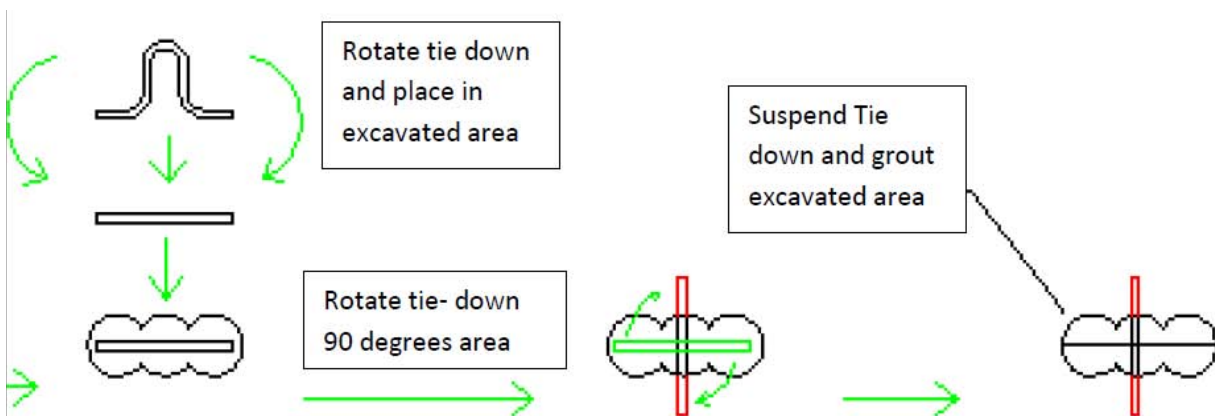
Hat Type Anchor Installation Schematic- Coring Method
